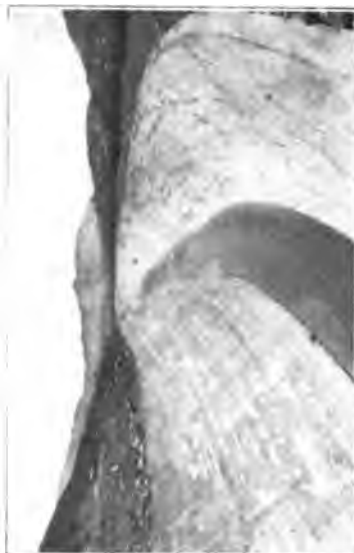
Concrete-Lined Section of Truckee Canal, Nevada. Ninth section, rounding Wadsworth Point at mouth of canyon.
